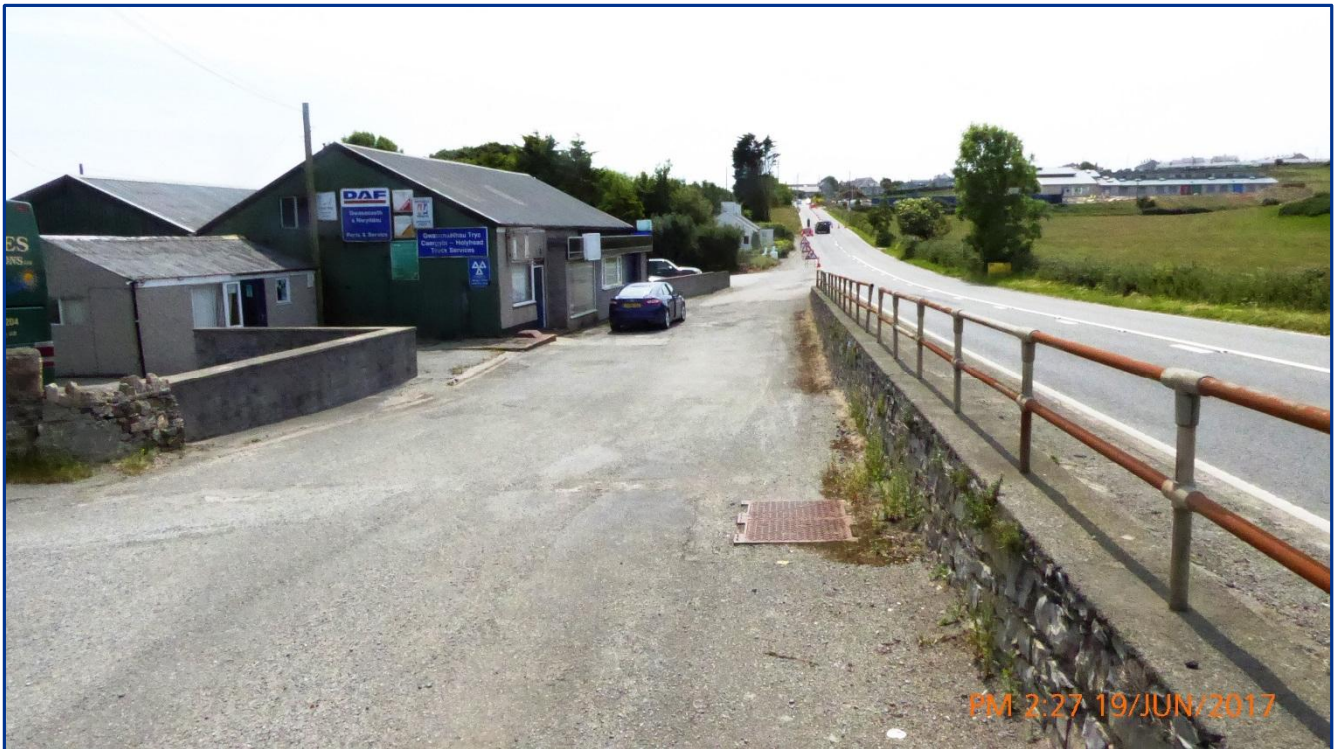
Image showing the extent of the existing service road and the proposed Off-site Power Station Facilities access.
